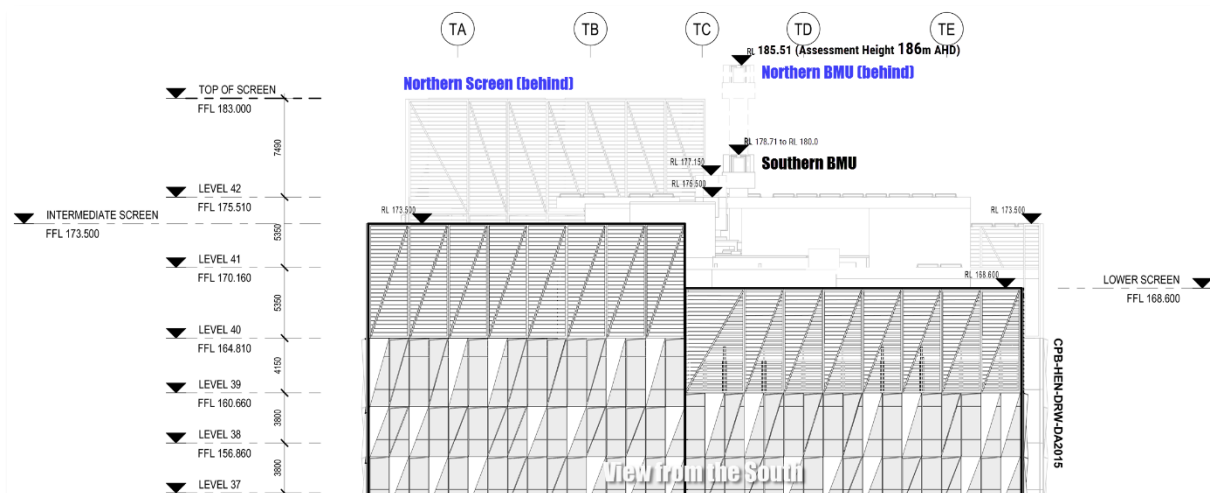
South Elevation: BMUs in relation to the Roof Profile
